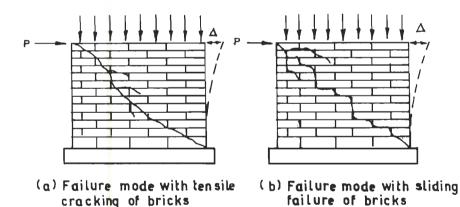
Failure Behaviour of Shear Walls
